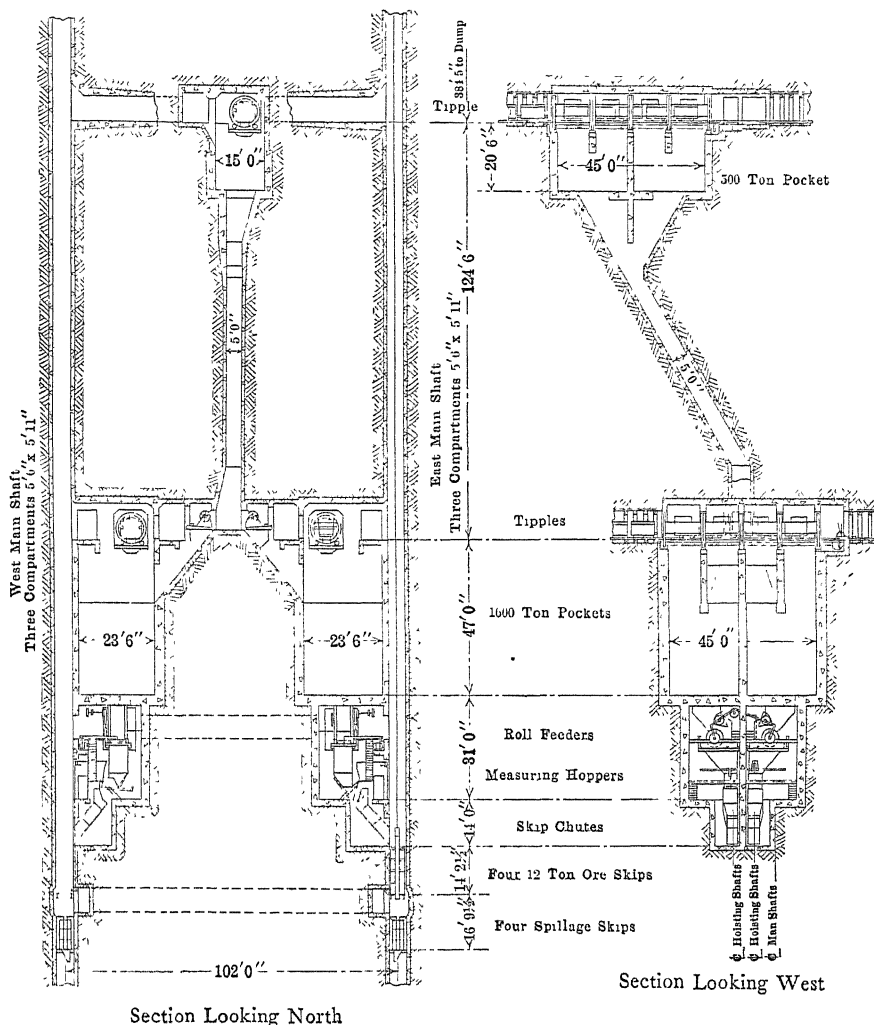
ARRANGEMENT OF UNDERGROUND POCKETS.
